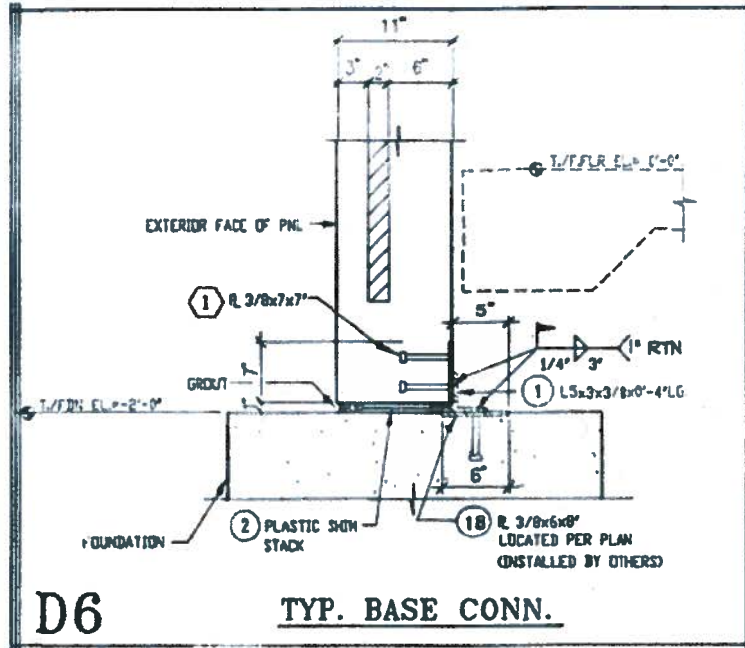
Typical exterior wall/foundation interface (PDM Shop Drawing E10)
